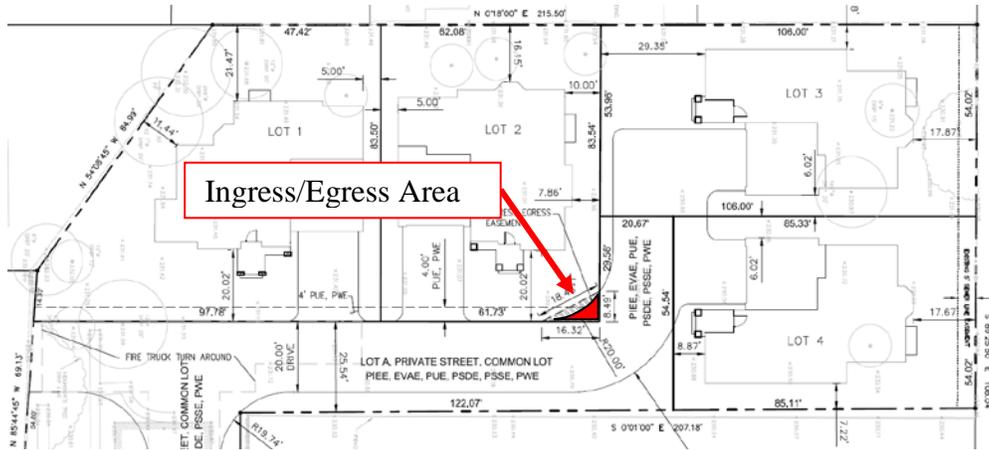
Site Configuration & Ingress/Egress Area over Lot 2
